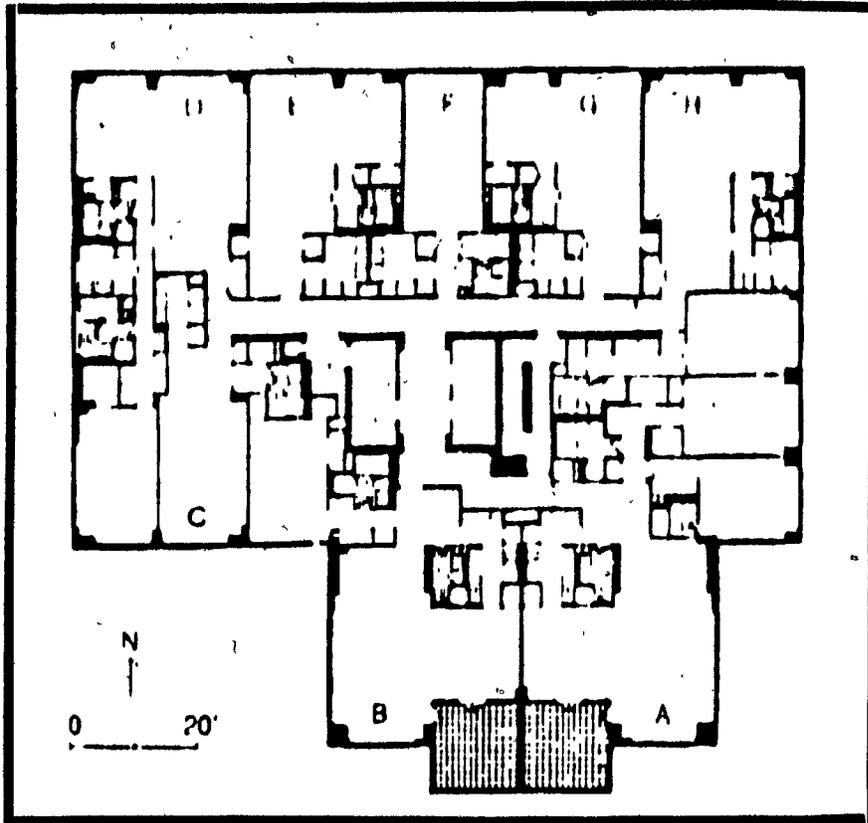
Apartment floor plan (floors 19 - 47 alternate)
